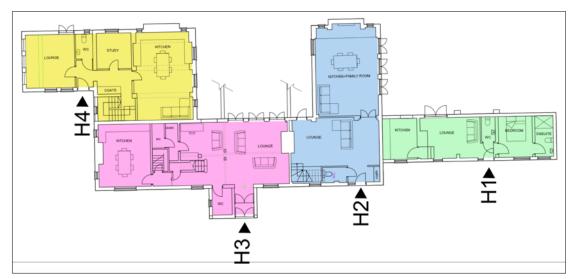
Proposed sub-division of the farmhouse and adjoining single storey range. Plan courtesy of Tyler Parkes.
